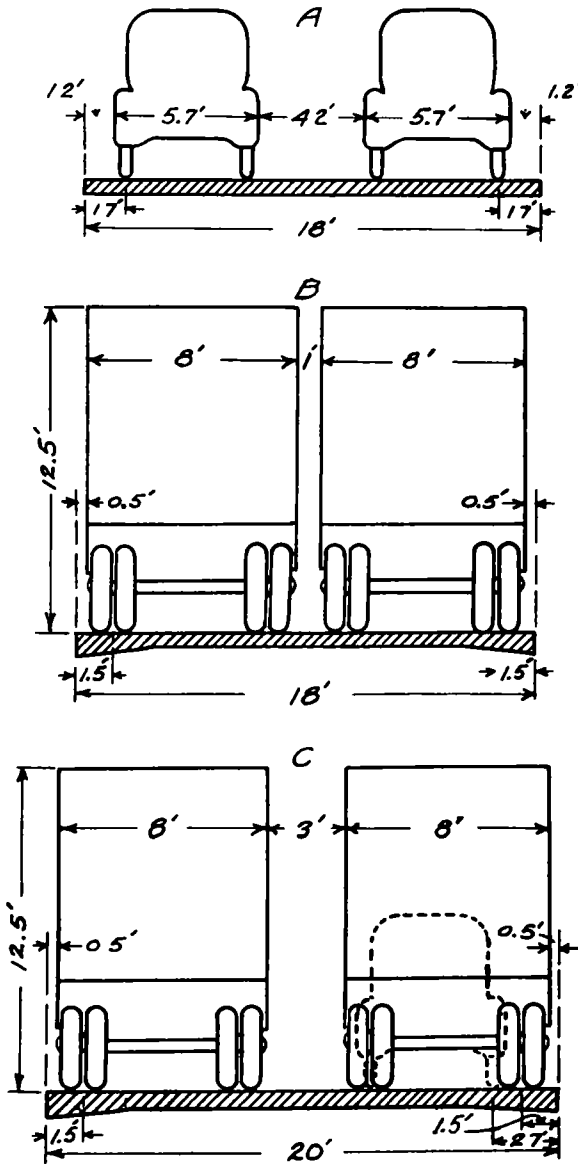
A Passenger Cars Passing on an 18-ft. Pavement. B. Trucks of Maximum Allowable Size Passing on an 18-ft. Pavement. C. Trucks of Maximum Allowable Size Passing on a 20-ft. Pavement. The outline of the passenger car shown in its normal position and superimposed upon the truck outline indicates how the maximum size truck obstructs the view for the passenger car.
